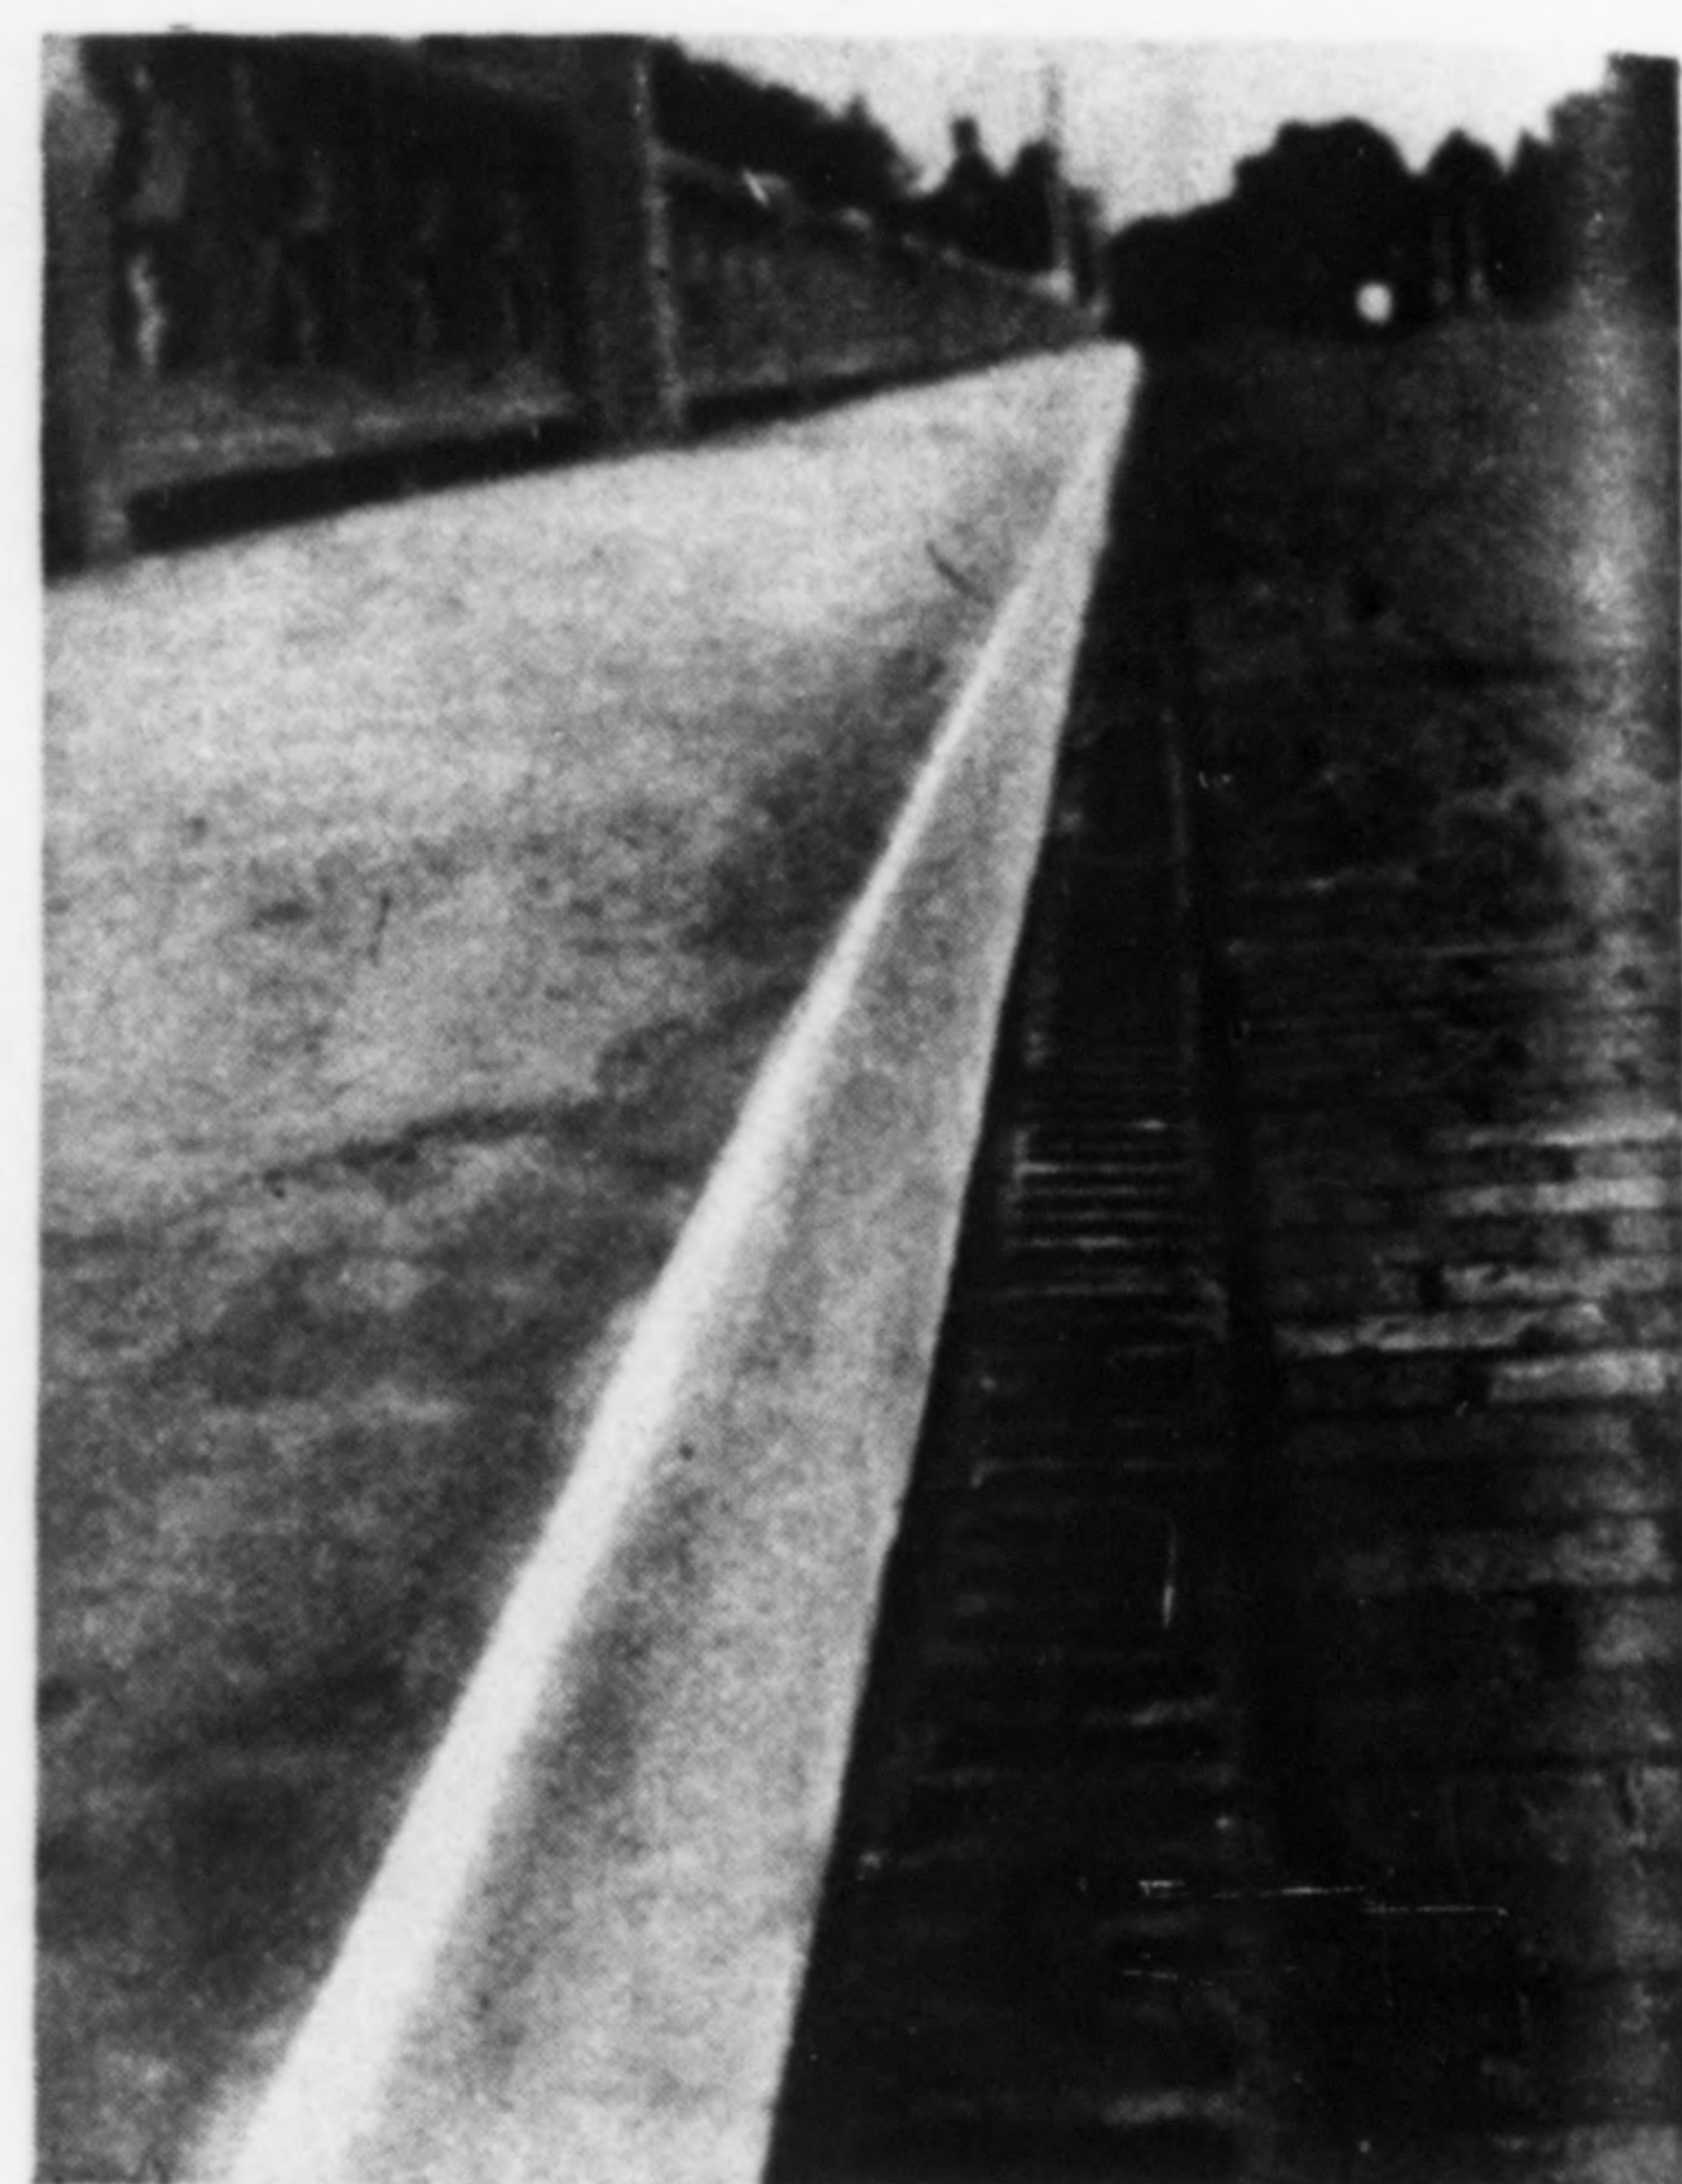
CONTINUOUS GRATING along the curb line drains the deck into copper troughs that slope toward 8-in. pipe downspouts inside the pier tower legs.
